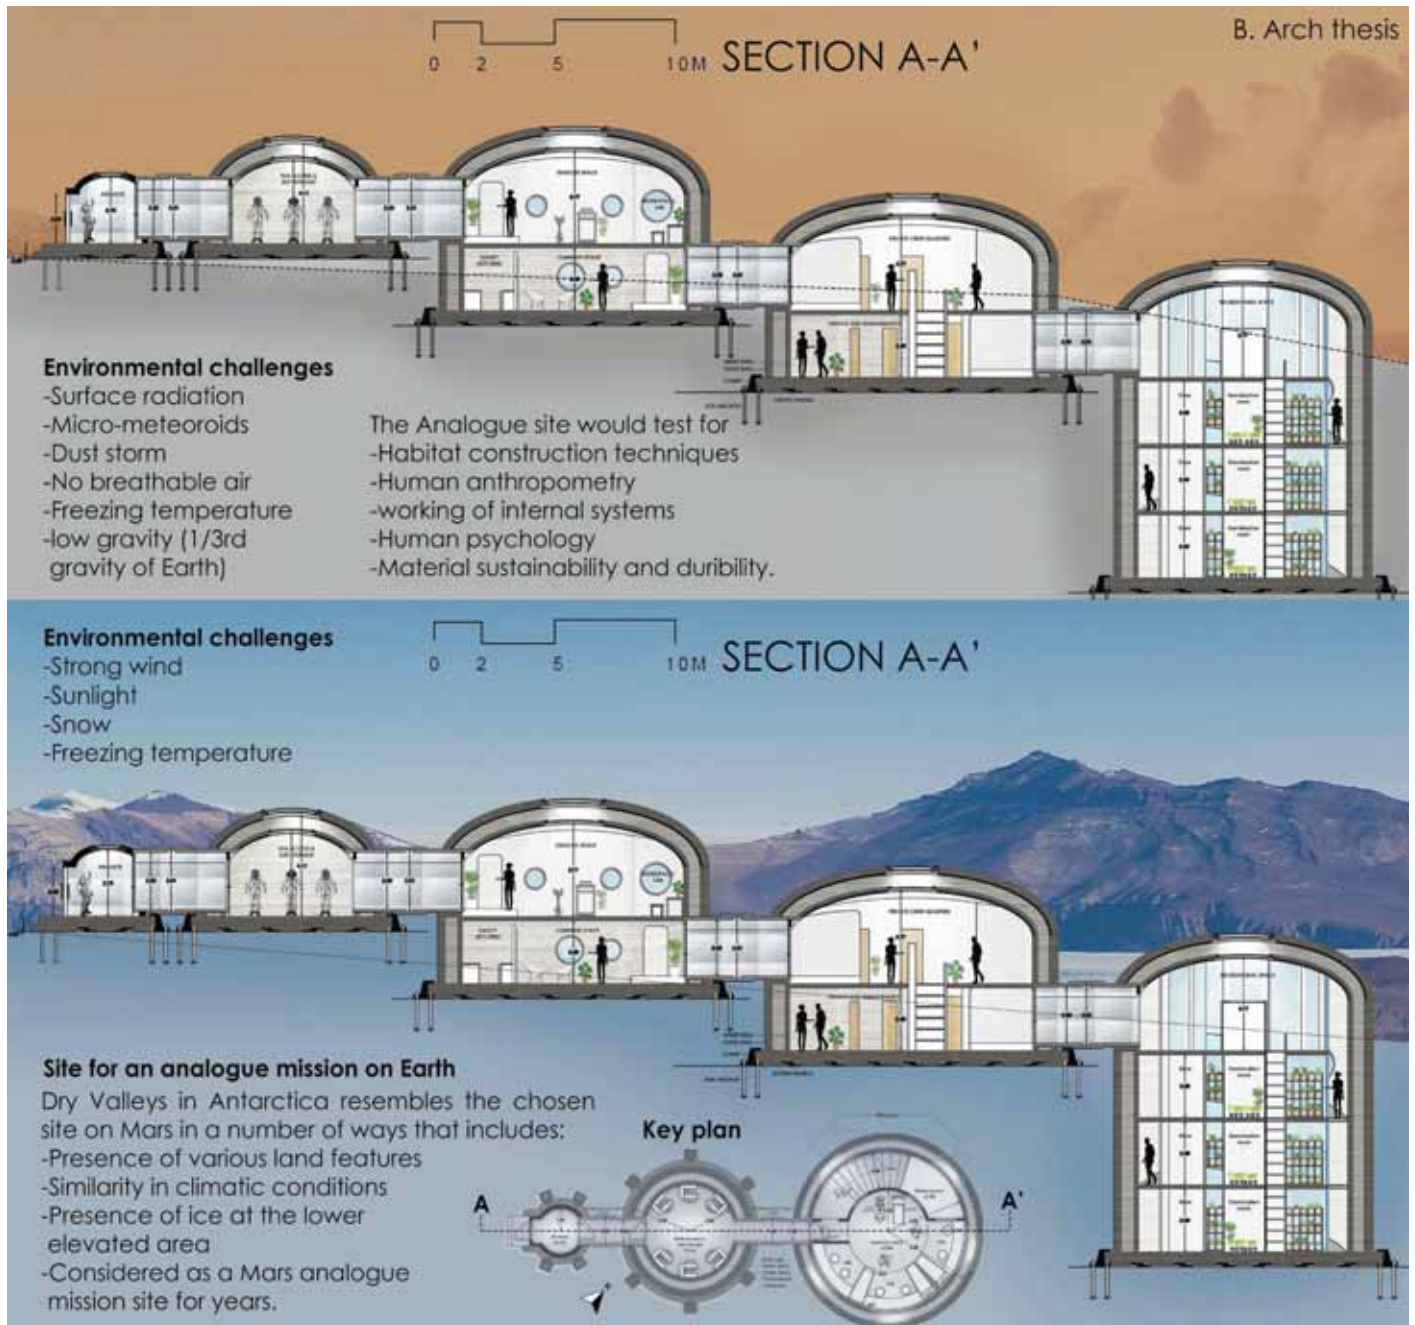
Detailed section through site (Mars) and detailed section through analogue site (Antarctica, Earth)
